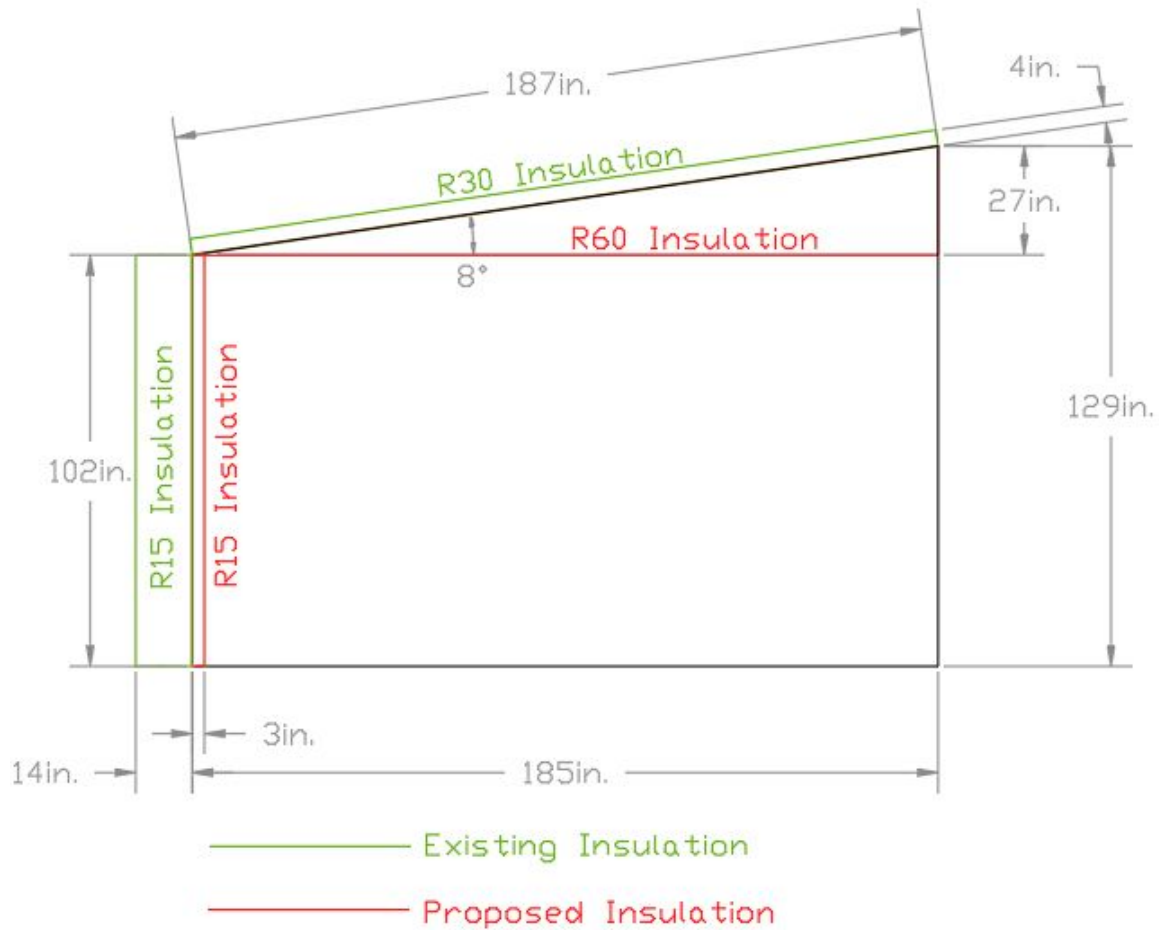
Dormitory Room Cross Section with Existing and Potential Insulation.
